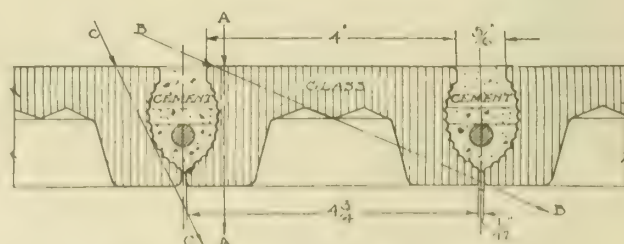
DETAIL VIEW OF CONSTRUCTION
